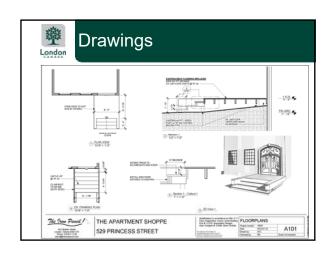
Drawing showing the existing porch of the dwelling at 529 Princess Avenue. Note the door and windows are not accurately depicted.
